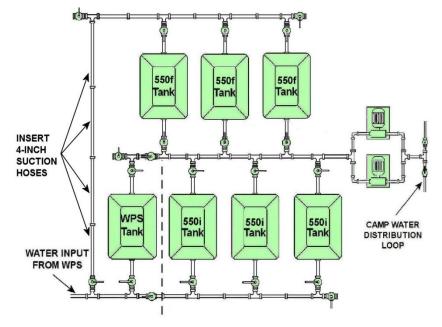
Assembly of 20,000-Gallon Tank Inlet Branches.
